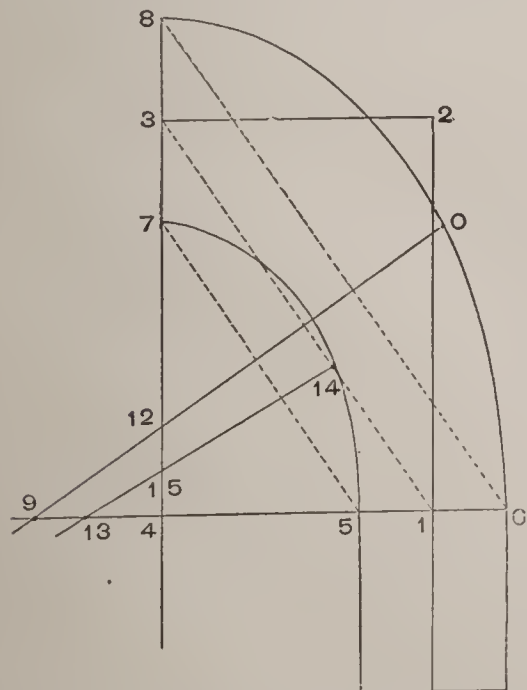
MOULD USED IN STARTING AND LANDING STRAIGHT.
